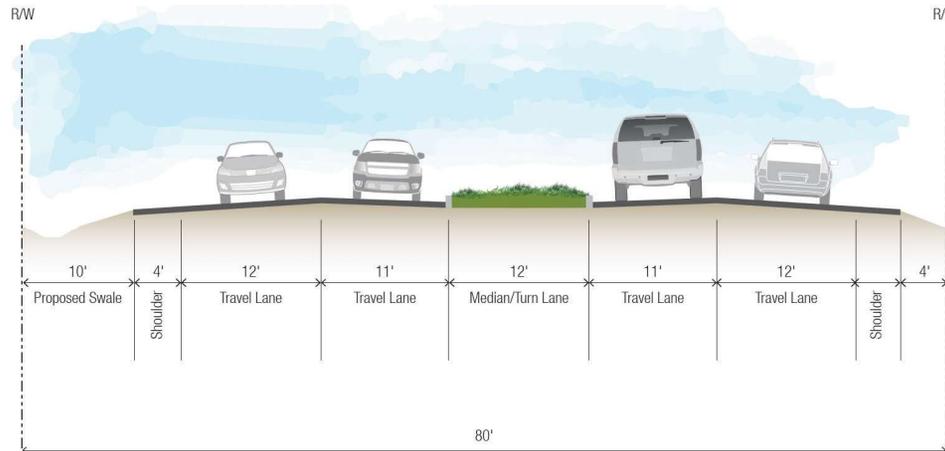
4-Lane Arterial Section--Vista Lucia Parkway west from Gonzales Slough to Highway 101 Looking West
